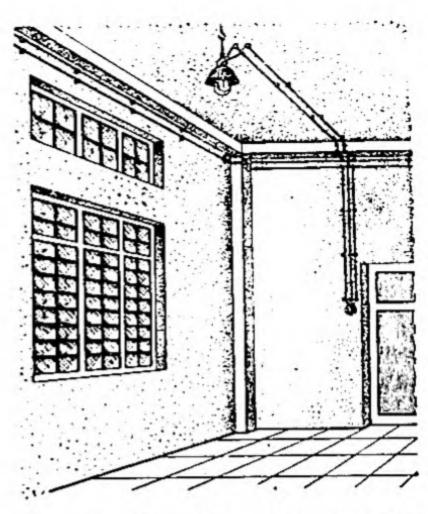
General appearance of wiring installed with wires supported on pin-type insulators.
